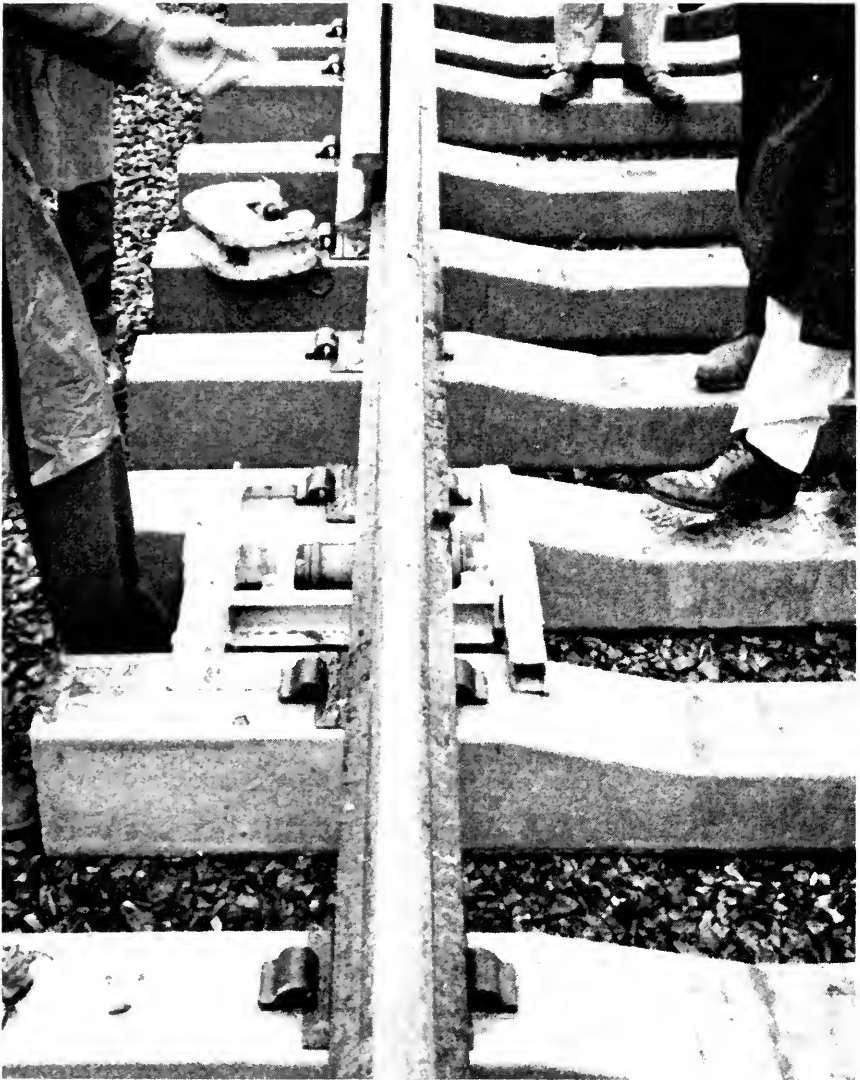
Portable roller used in unloading welded rail from worktrain to concrete ties on roadbed.
